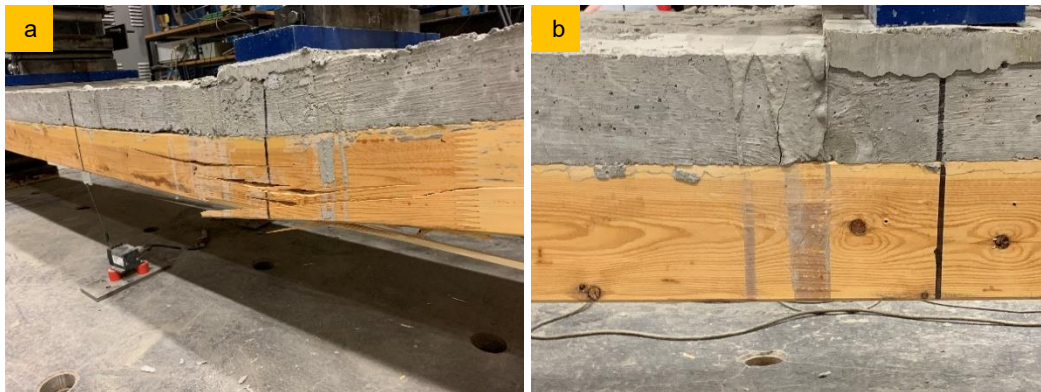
a) Timber fracture and b) concrete crack in tension zone; in specimen (#10) GLT4.5-C75-I15-45°-S500
